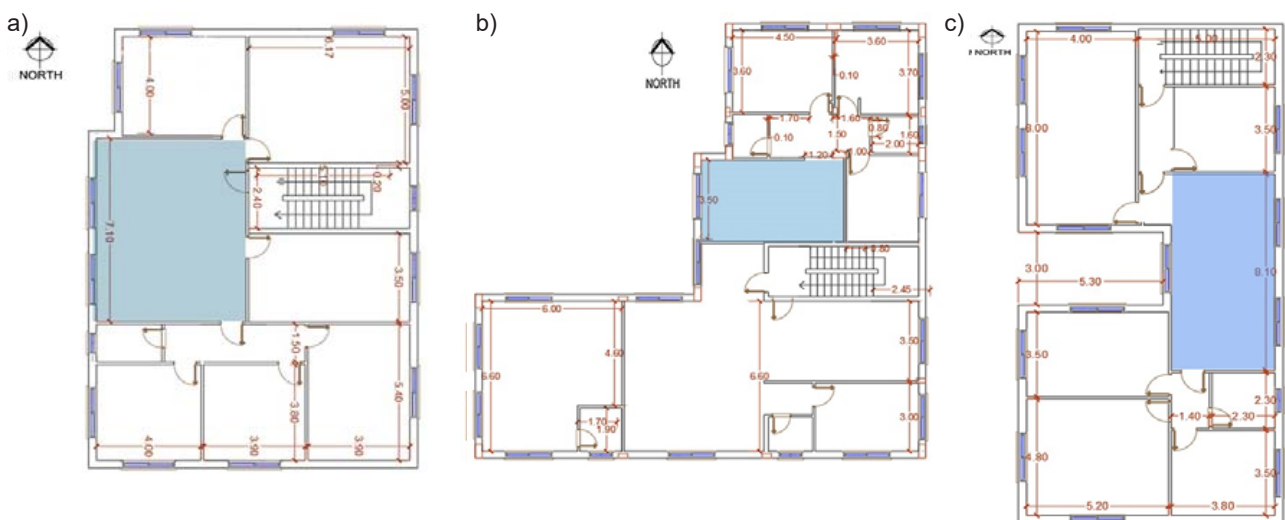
2D plans with the rooms in the buildings of different forms: (a) rectangular, (b) L-shaped, and (c) U-shaped
